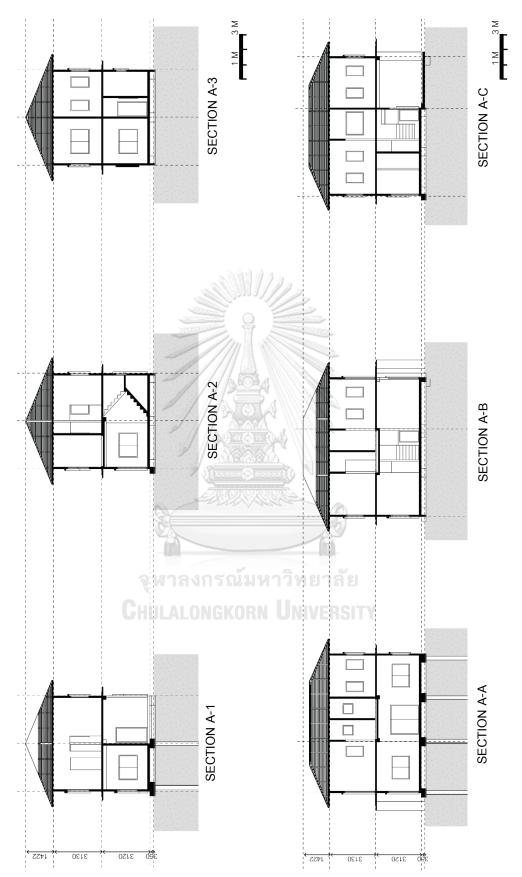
Drawing of front section cut of A1 unit at section A-1, section A-2, section A-3 and a side section cut of A1 unit at section A-A, section A-B, and section A-C.
